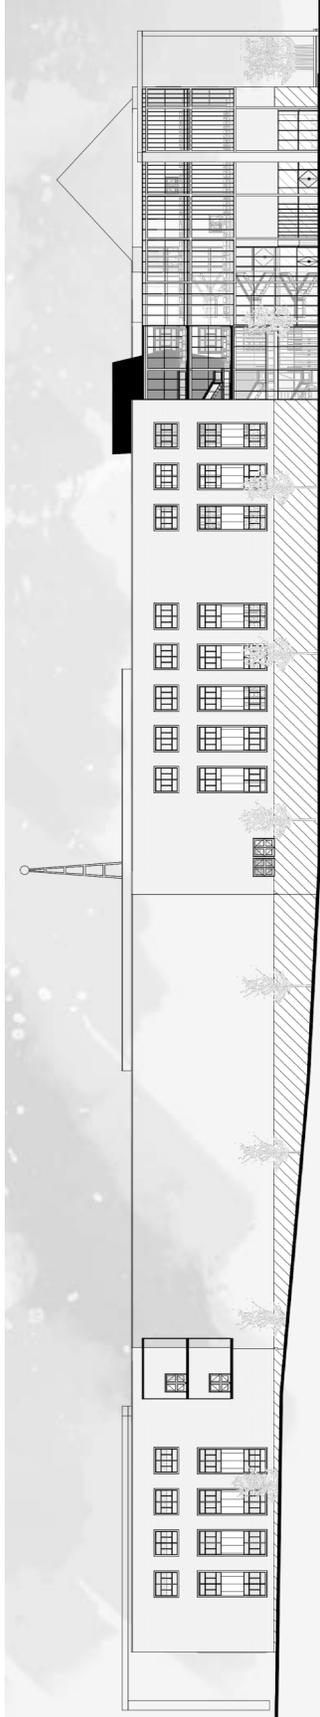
Kerr Hall West Exterior Elevation from Victoria Street Lane
